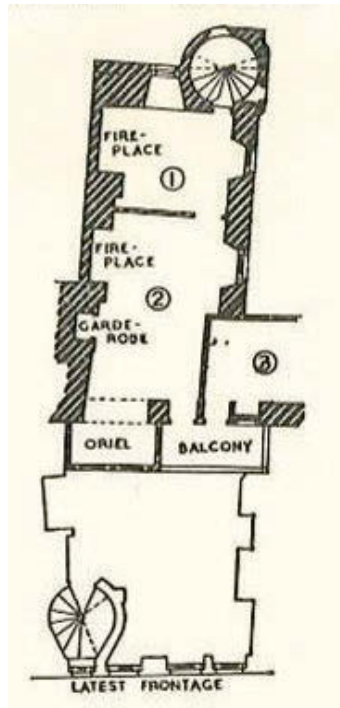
Suggested 16th century arrangement, 1st floor ad above (RCAHMS, 1951, 75)
